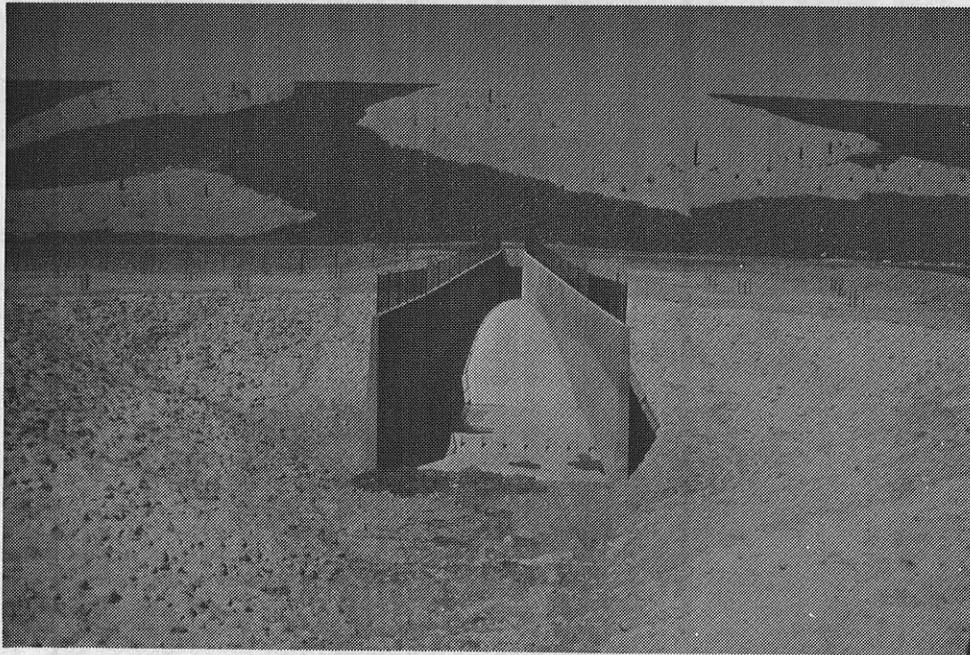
Looking upstream at energy dissipator and downstream face of dam embankment from gaging station bridge. March 1985
